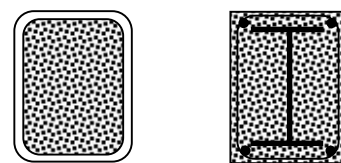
Concrete-filled Tube and Concrete Encased Section
